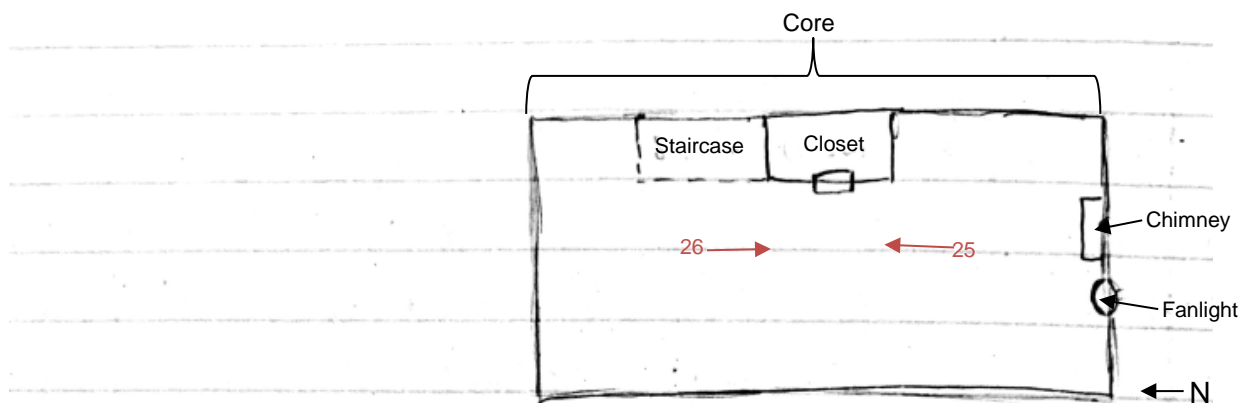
Floor Plan Sketch and Interior Photograph Key of the Attic. Sketch not to scale.
